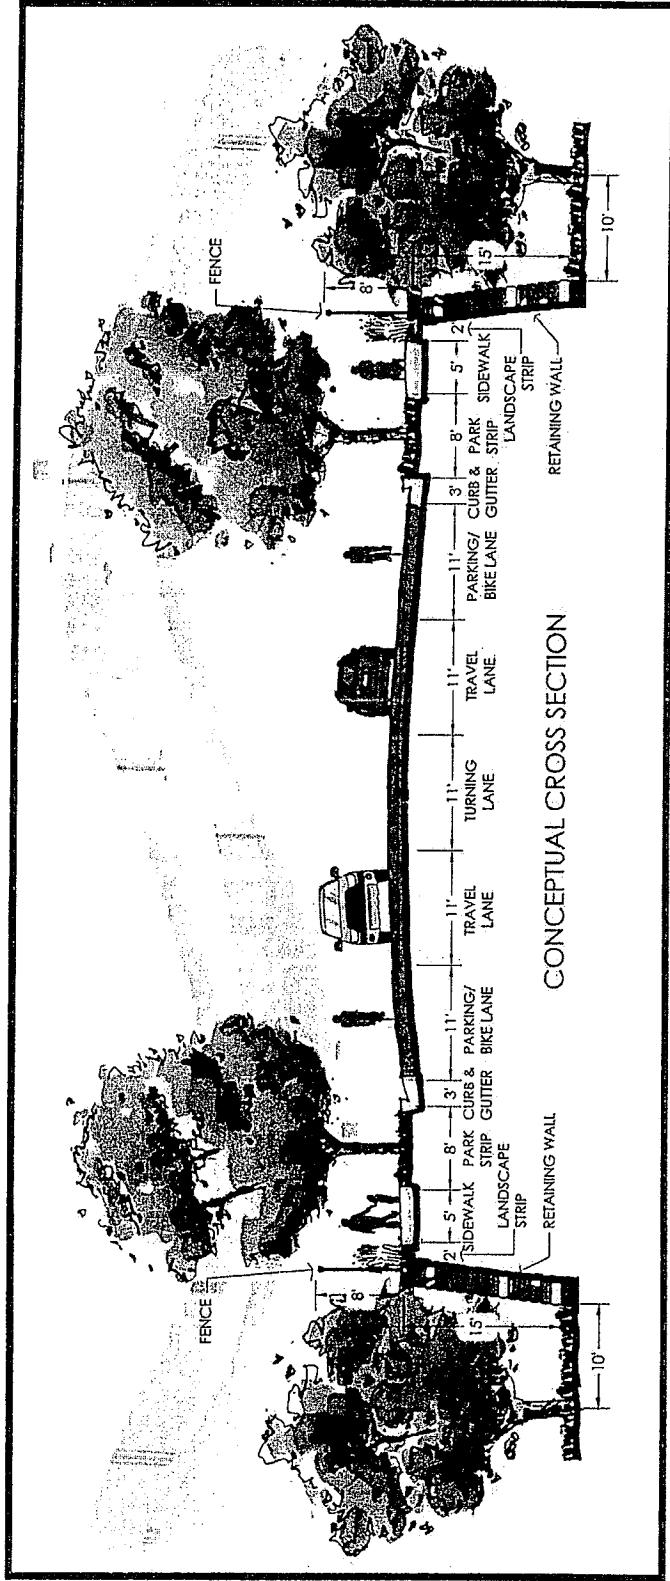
, Proposed Cross-section Center Street to 100 South
